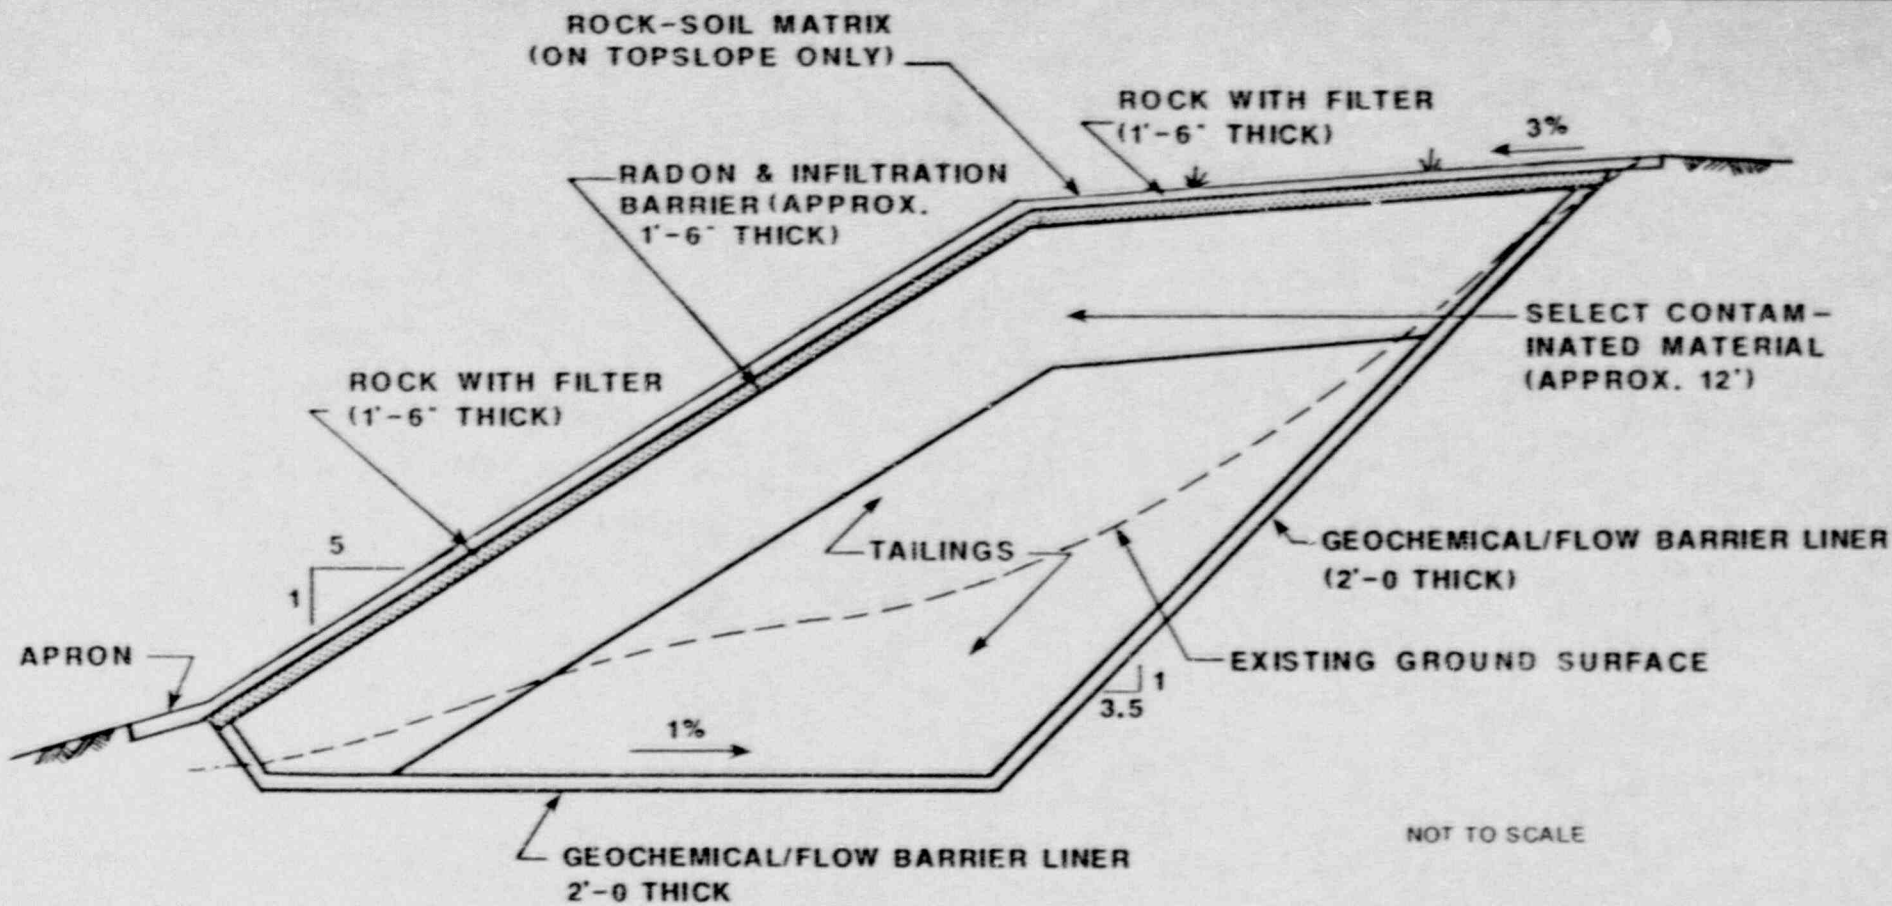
COLLINS RANCH DISPOSAL SITE TYPICAL CROSS SECTION
